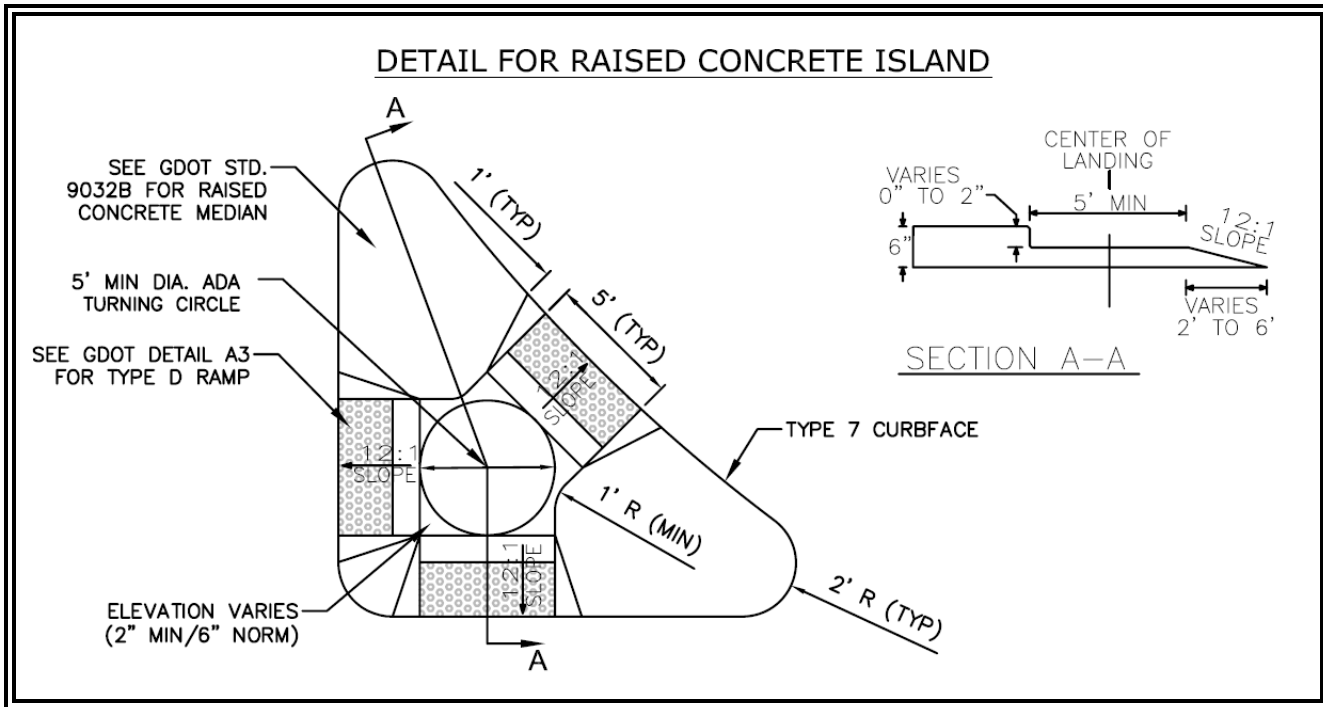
RAISED CONCRETE ISLAND WITH RAMPS
